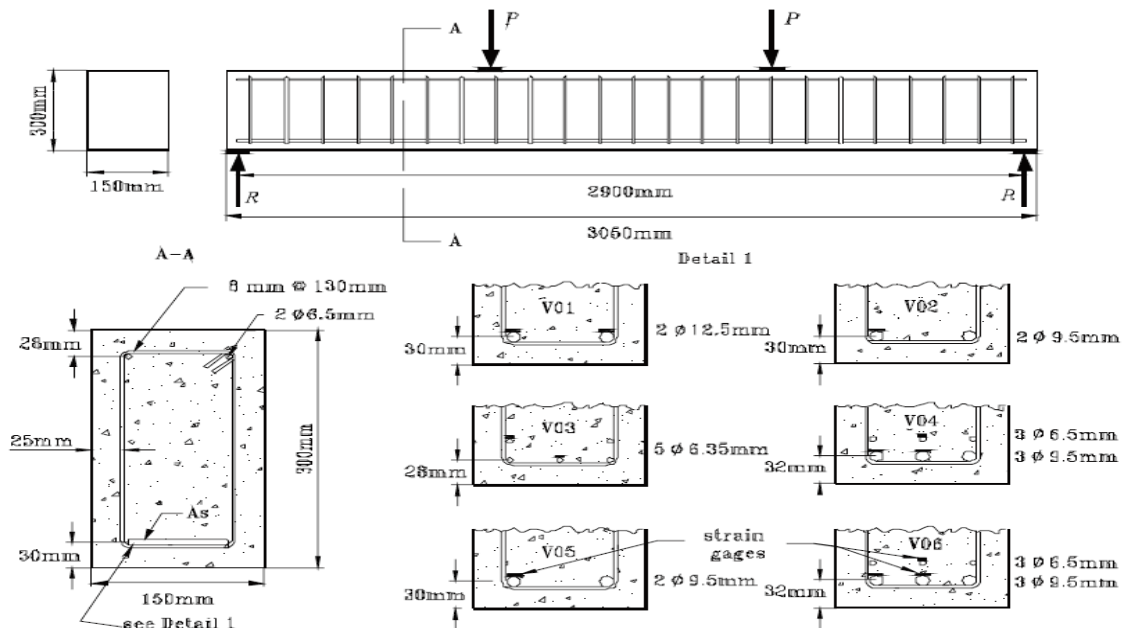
Geometry and experimental setup of the concrete beams (16)
